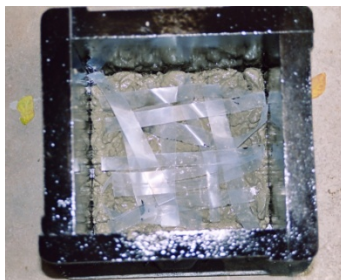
Photograph Showing the Arrangement of Polythene Sheet in Cube Mould
